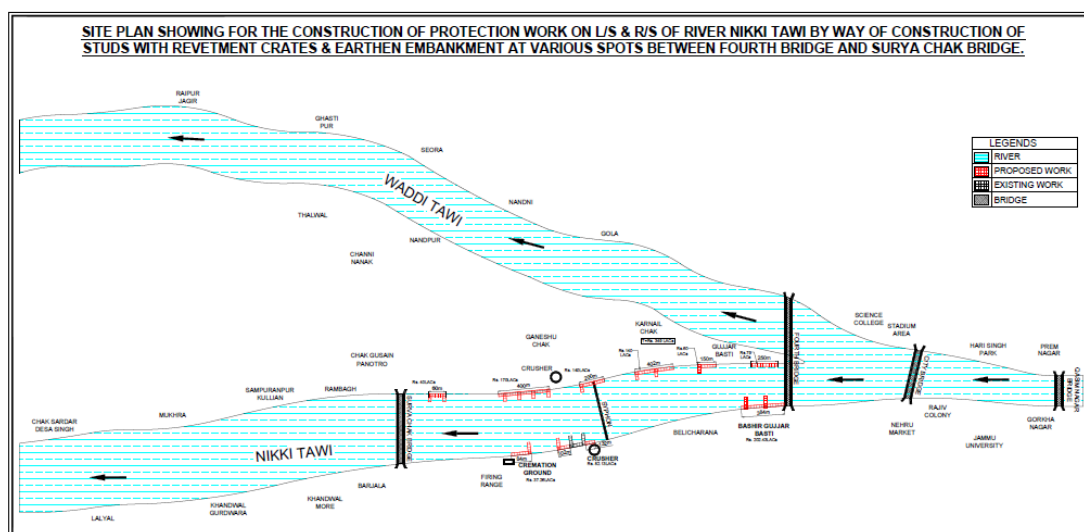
Site Plan of existing and proposed protection works in the Nikki Tawi between 4th Bridge and Surya Chak Bridge.
